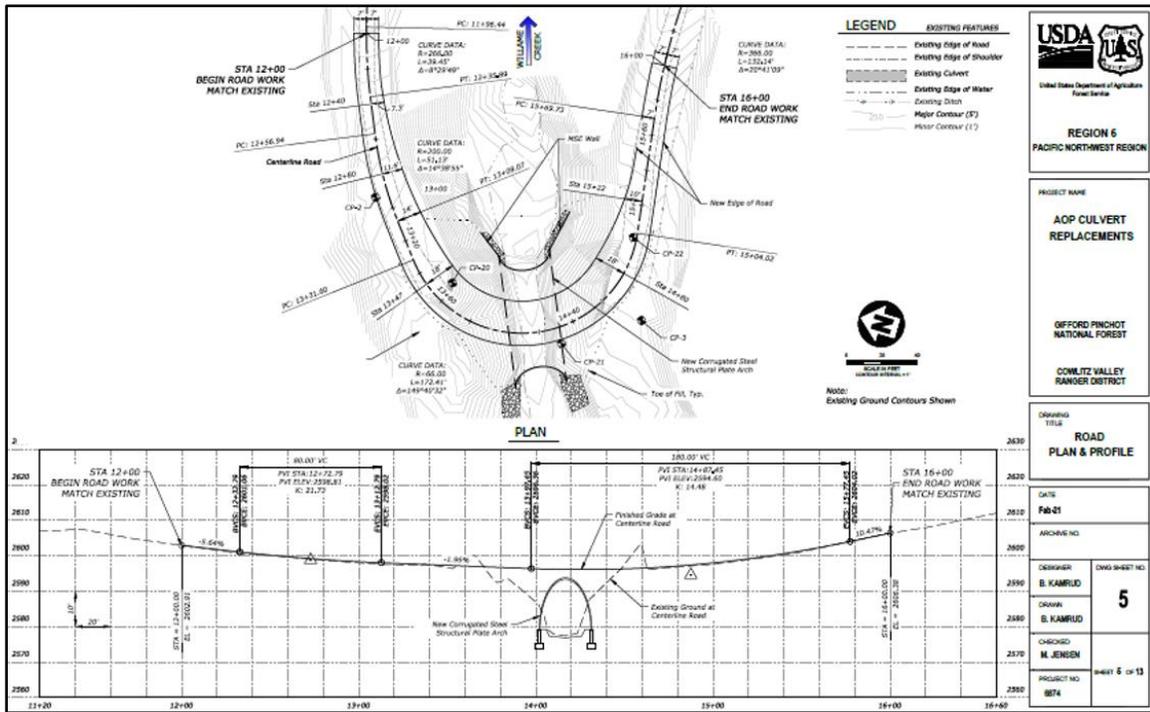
Road plan and profile of a typical open-bottomed arch structure with pre-cast concrete footings to provide AOP at all flows and life stages.
